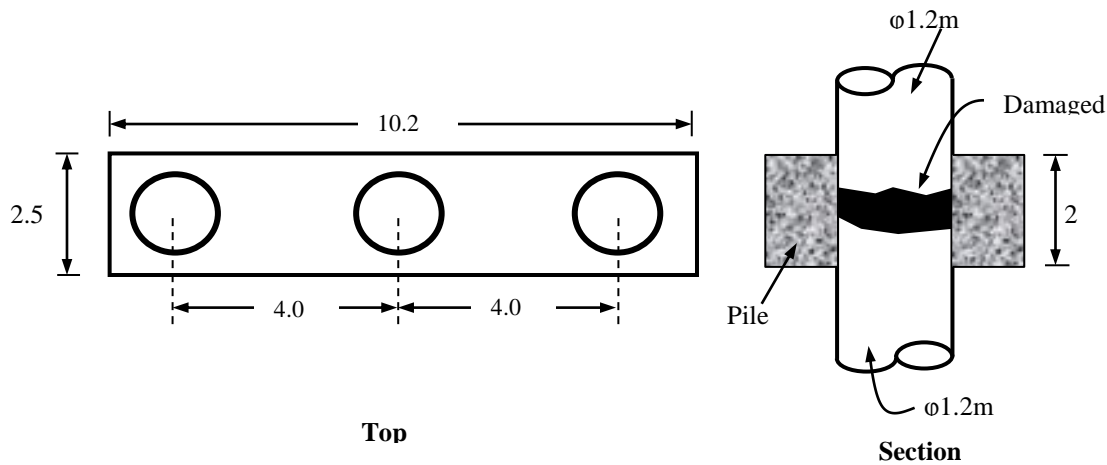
First Proposal, Pile Cap around Damaged Joints
